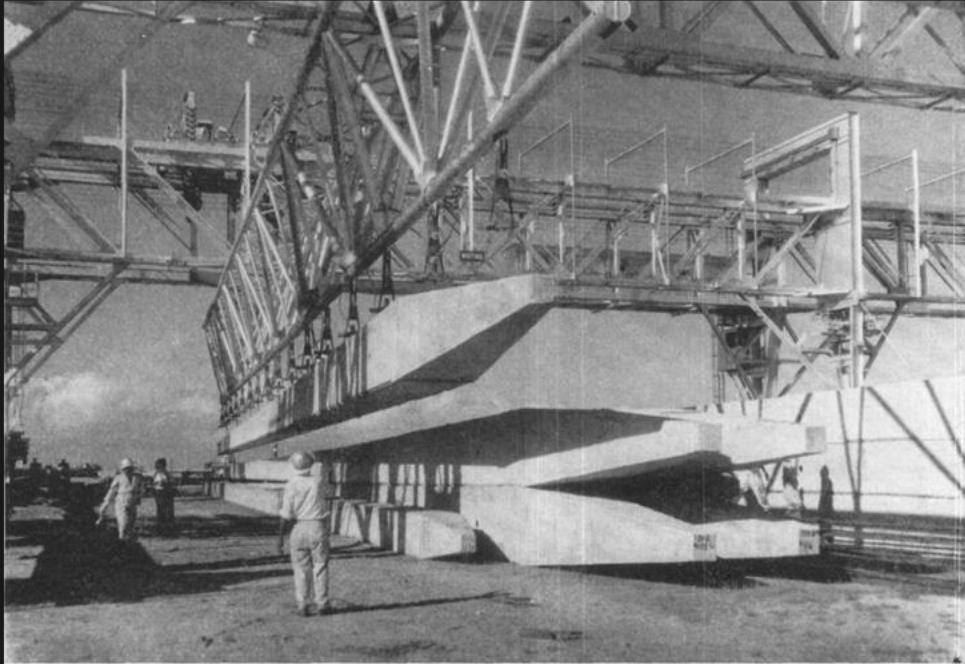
View of Pile Casting Yard Showing Concrete Piling Used in Lake Maracaibo Well Foundations.
